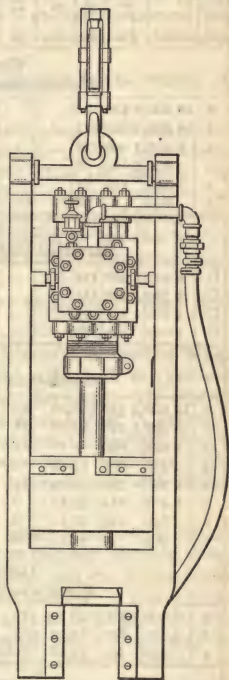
Large-size Power-hammer for Driving Sheet-piling Planks
